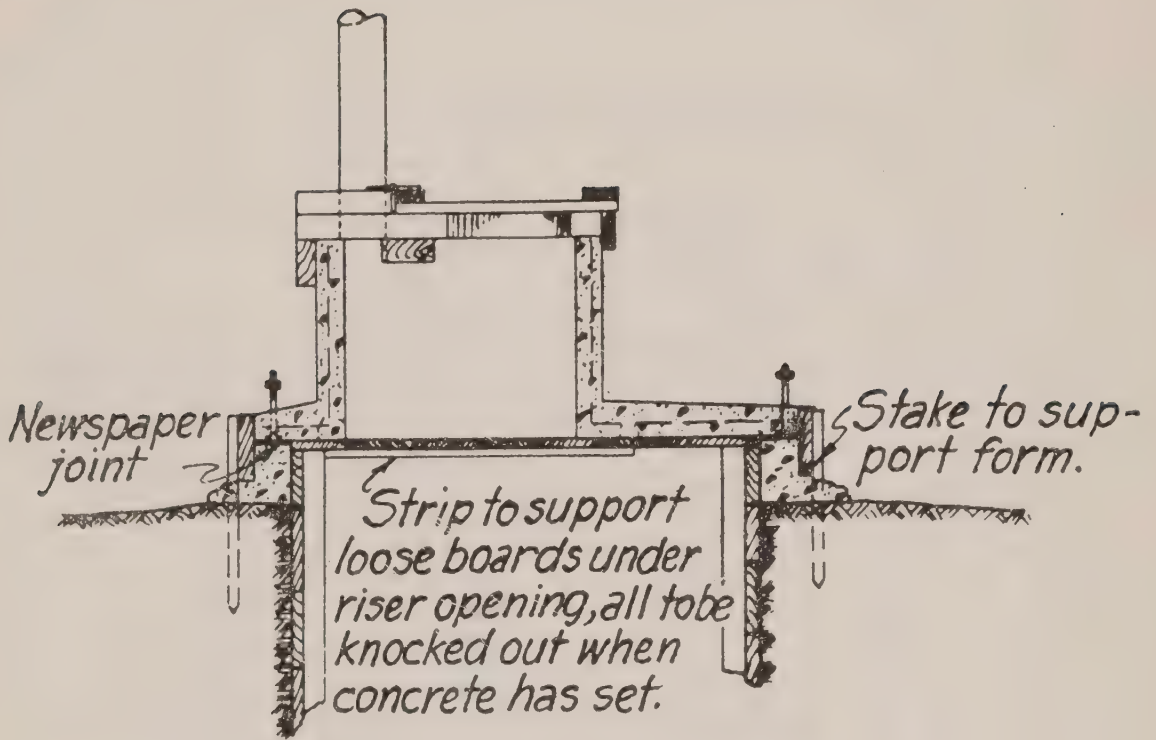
Suggested concrete-floor concrete-riser pit privy. (From Supplement No. 108, P. H. Reports.)
